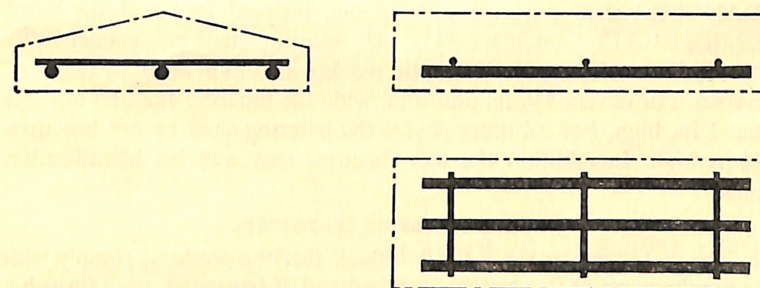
One typical arrangement of reinforcing rods and transverse reinforcement
